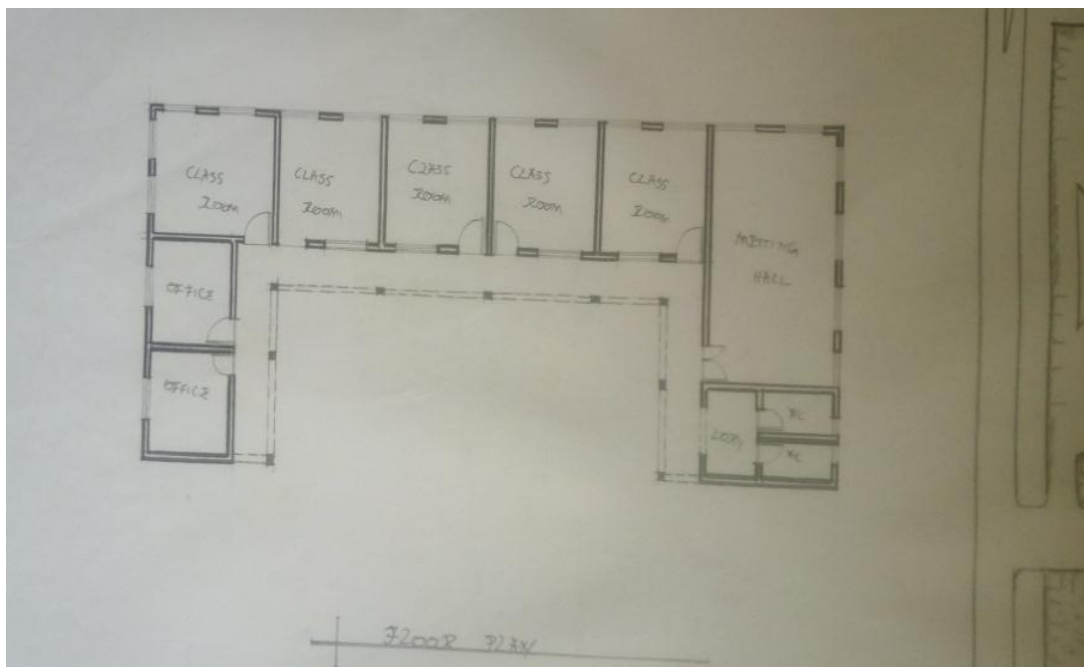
FLOOR PLAN OF CASE STUDY ONE
